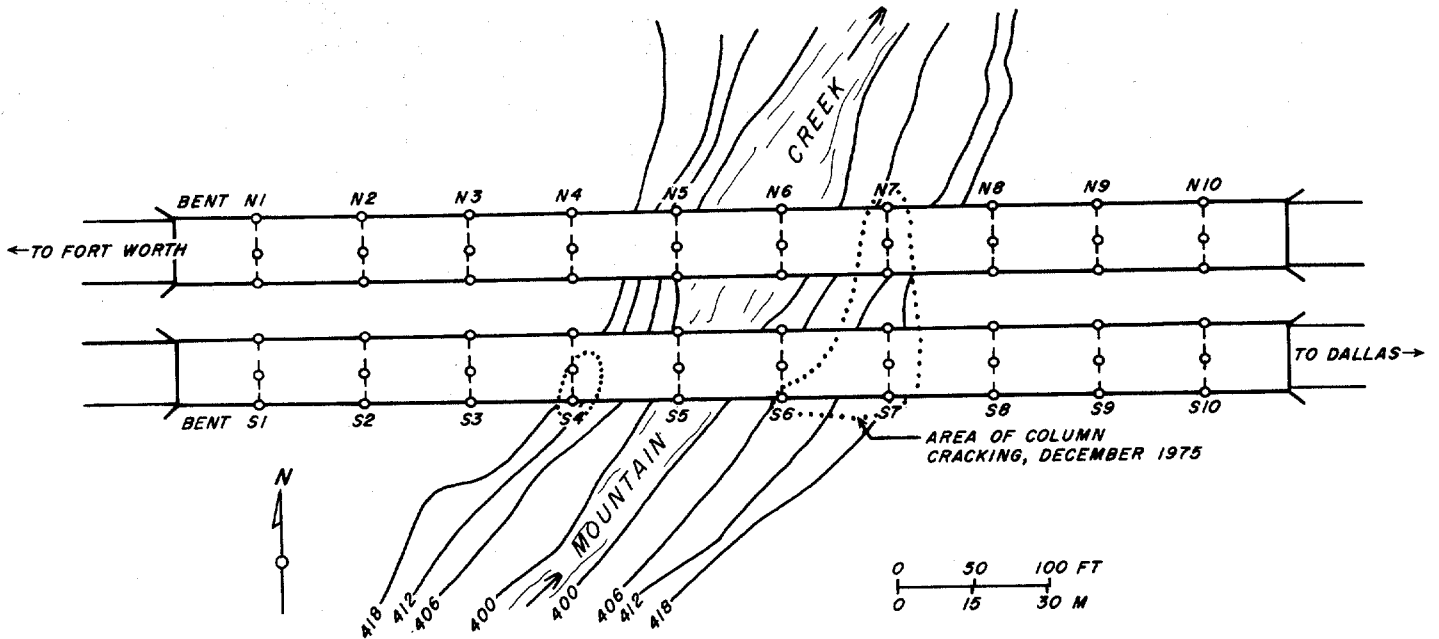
Plan sketch of turnpike bridges, showing contours of creek channel and location of cracked columns.
